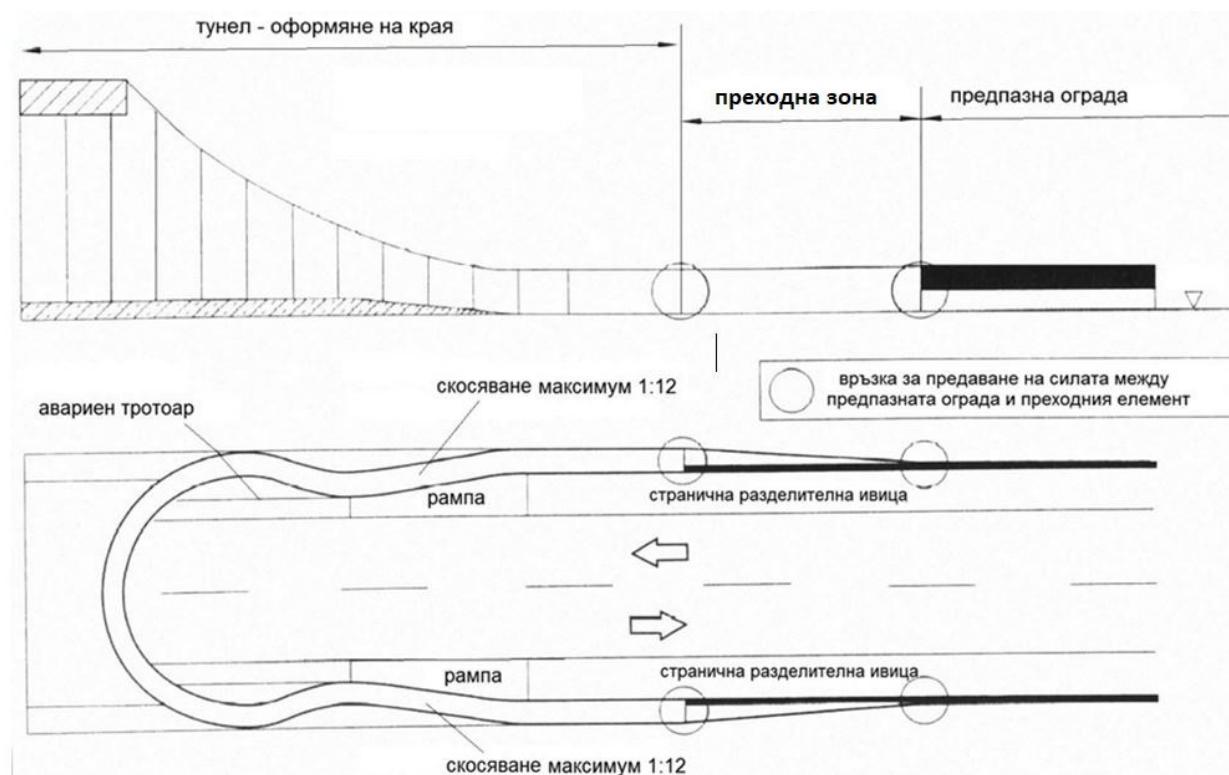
Forming a connection between a road restraint system and the start of a tunnel
